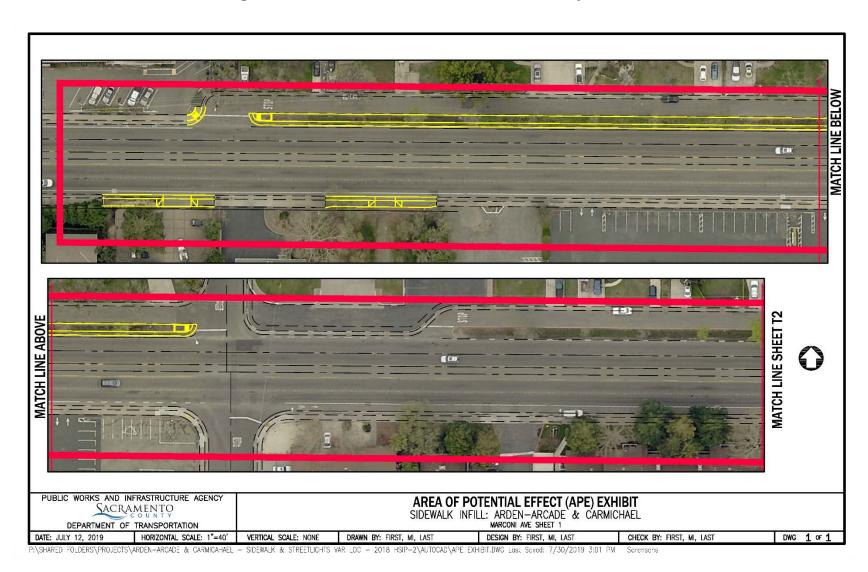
Marconi Avenue near Eastern Avenue Project Plan Exhibit
